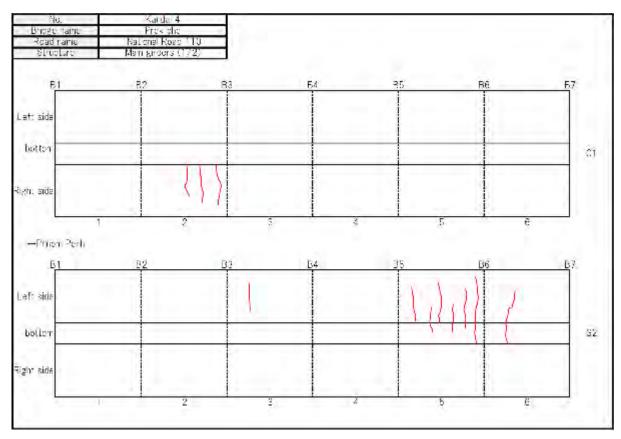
Inspection Sheet (Prek phe: Kandal. Bridge No. 4)
